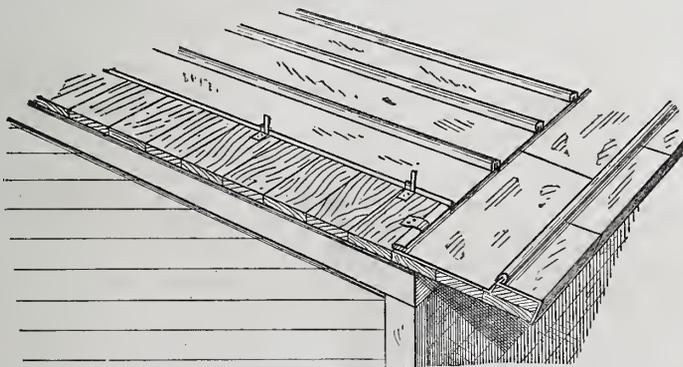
Method of Making a Gutter in an Iron Roof.—Employing a Wooden Strip to Get the Necessary Fall.
